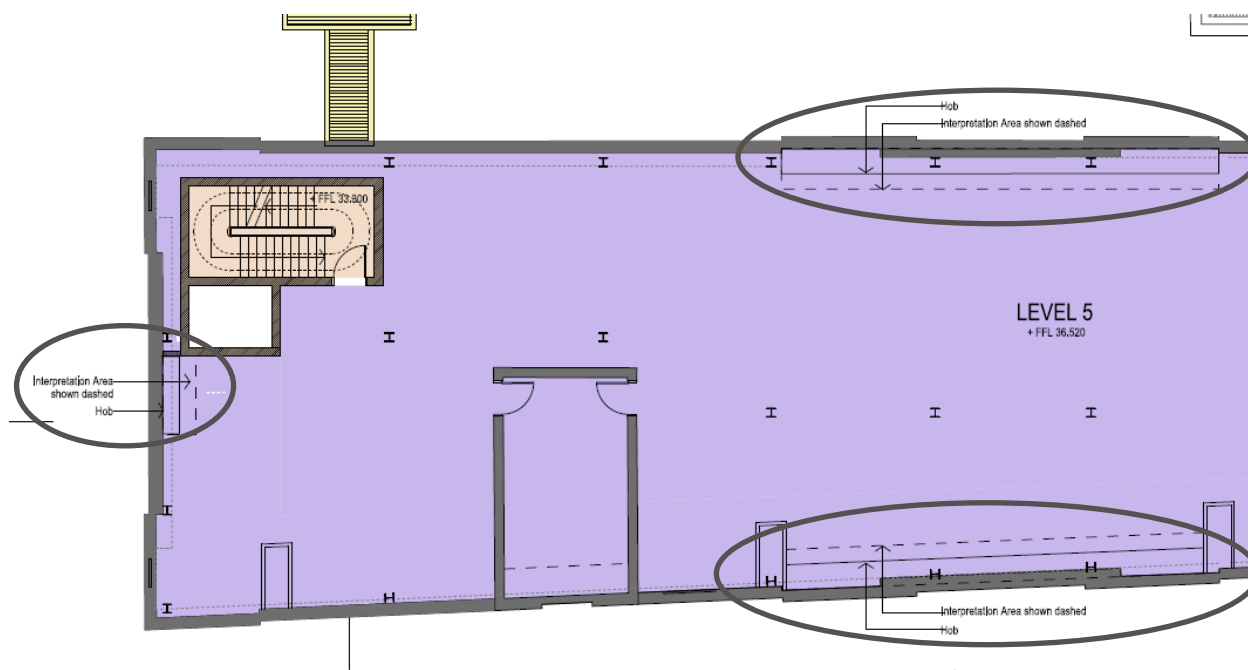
Part plan of proposed level 5 illustrating three of four identified potential interpretation zones.
